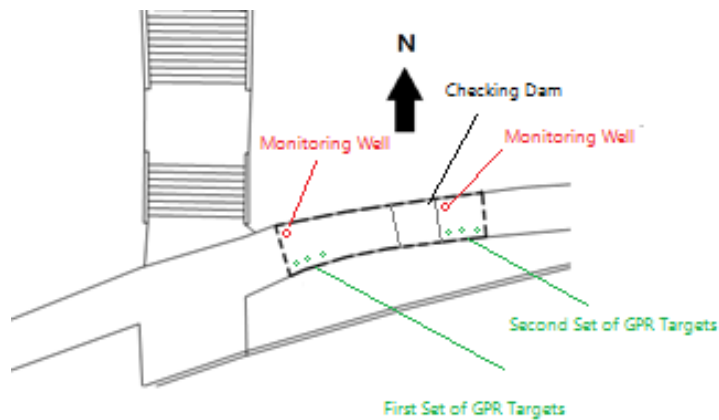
Plan view of position of installation, dam, observation wells, and ground penetrating radar (GPR) targets not used in this research.
